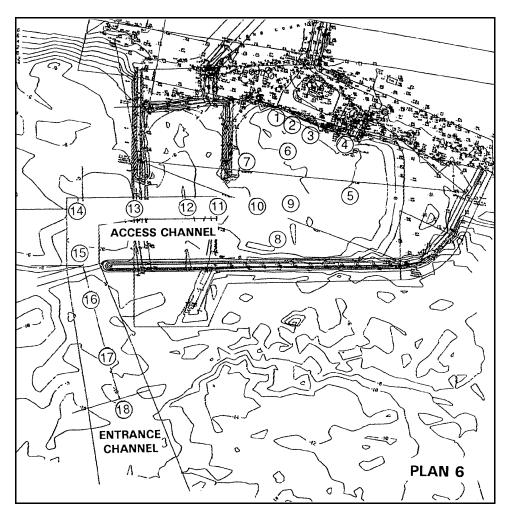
Kikiaola Harbor alternative plans and model stations
